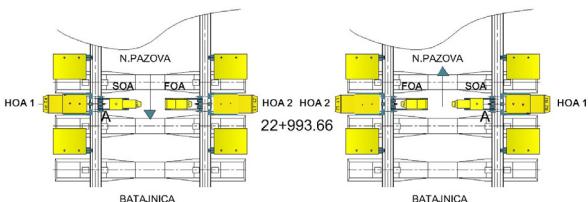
Module 3 of the Batajnica measurement checkpoint
